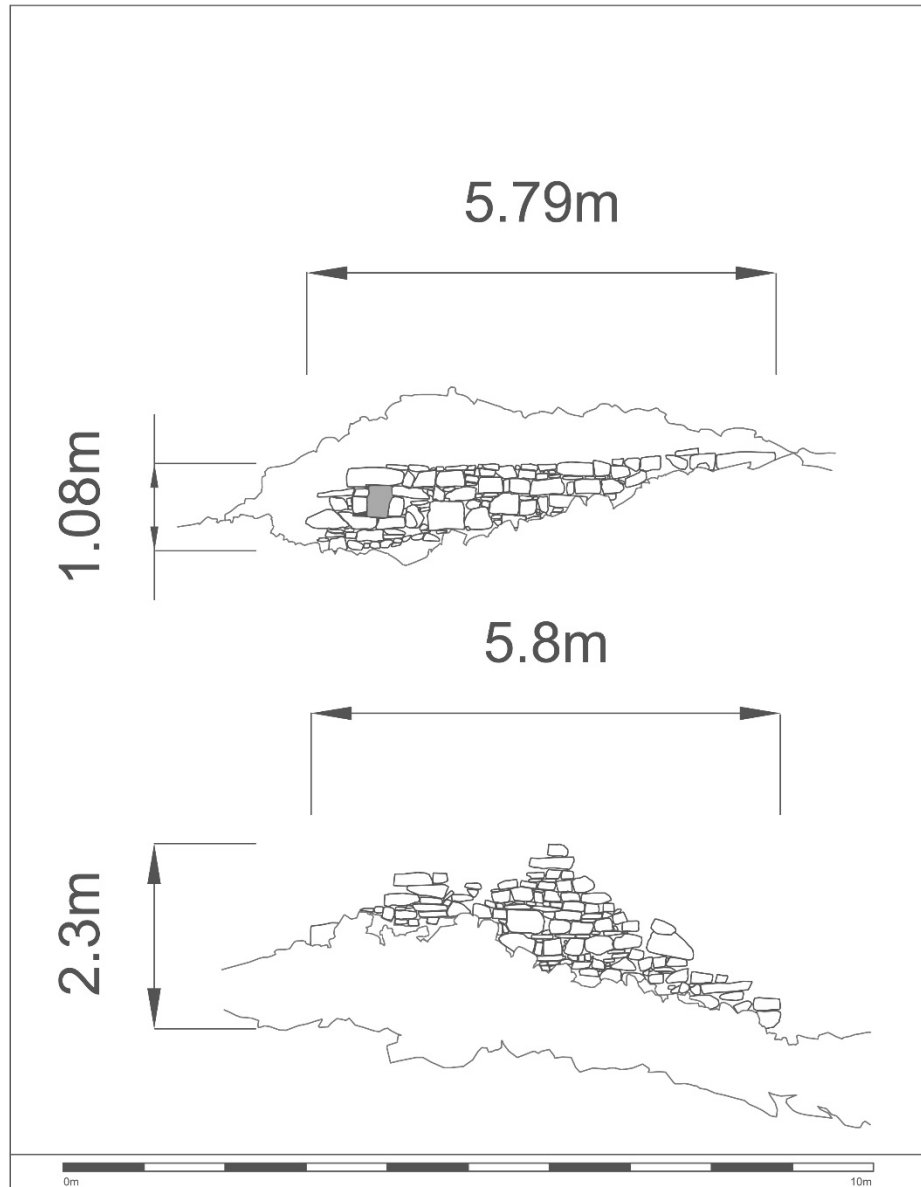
External elevations of the south (top) and west (bottom) walls of the signal tower at Glink Signal Station. The chute passing through the western side of the southern wall is shaded in grey.
